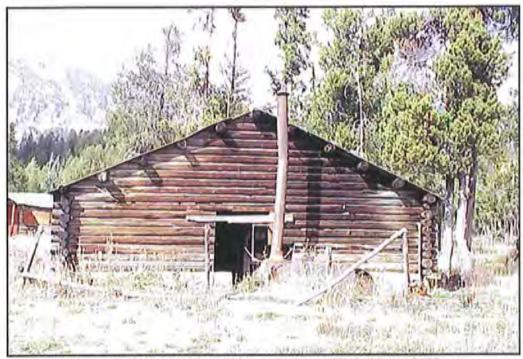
East wall of HS-1162, the Bathhouse. Source: A&E Architects, 2004.
